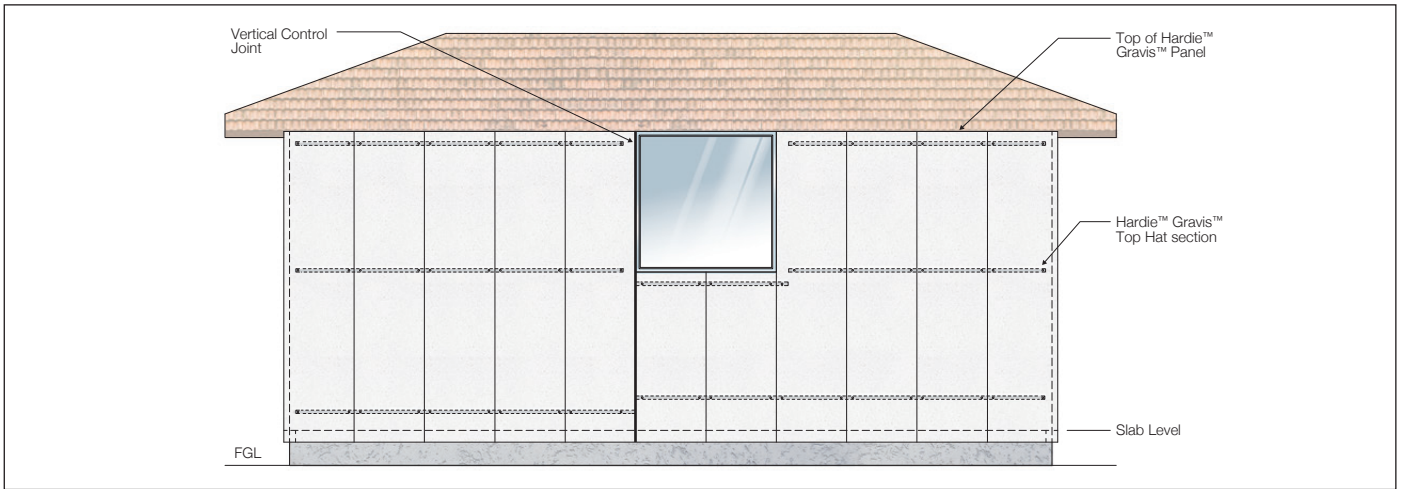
SINGLE STOREY LAYOUT - HIP ROOF ELEVATION
